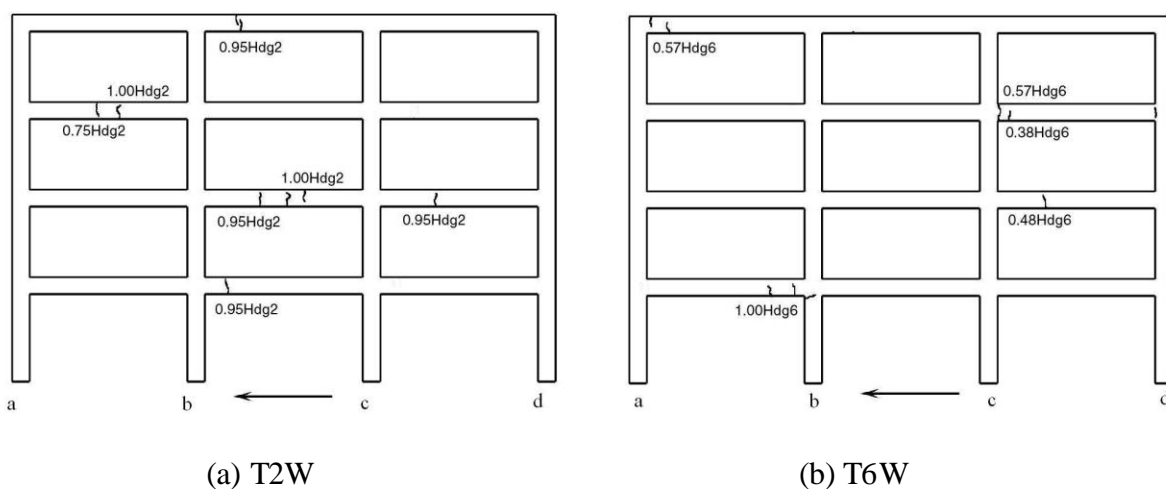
Locations and stages of structural cracks in the frames with directional arrow showing excavation position (note that only structural cracking was visible due to model size).
